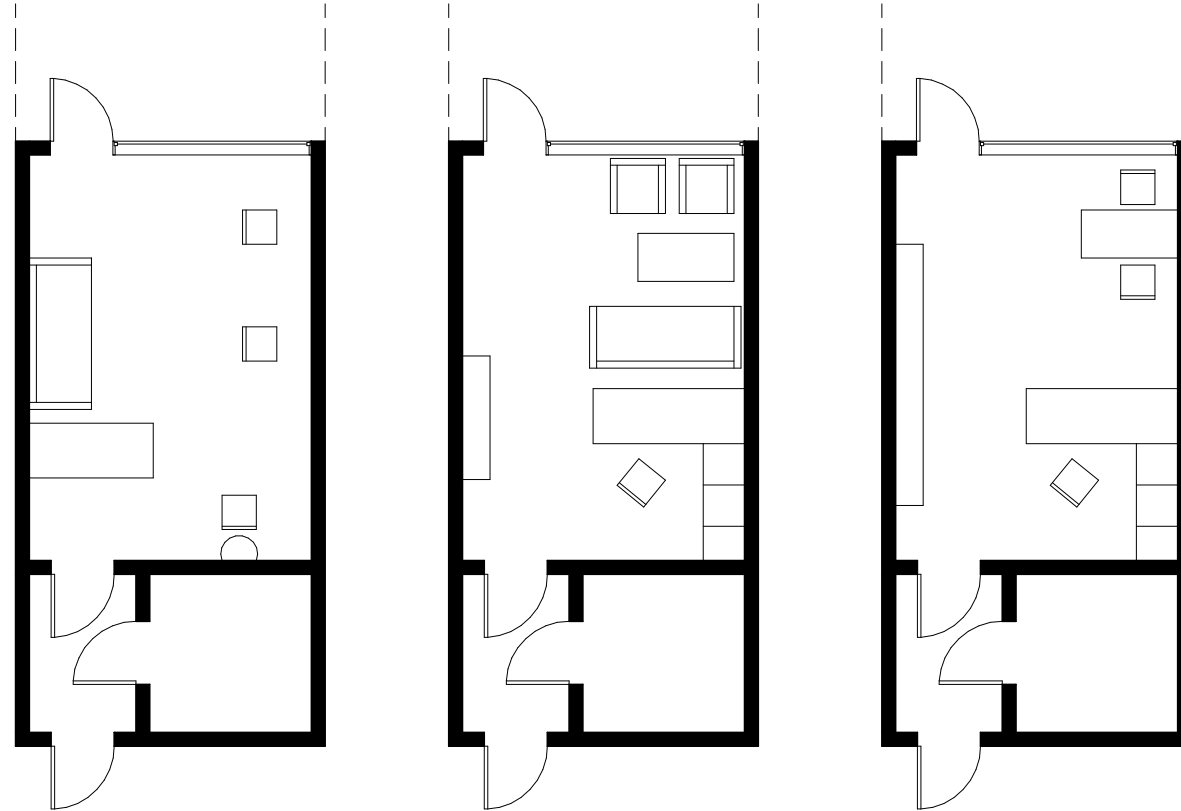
Examples of redrawn and tested layouts for Kilströmskajen bokaler
